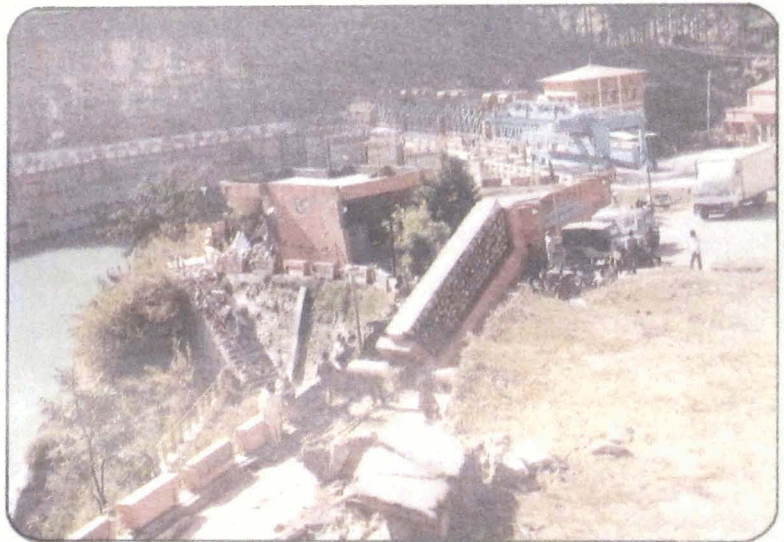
Wall collapses and gaping cracks in type B construction and failure of retaining wall just upstream of Maneri dam.
